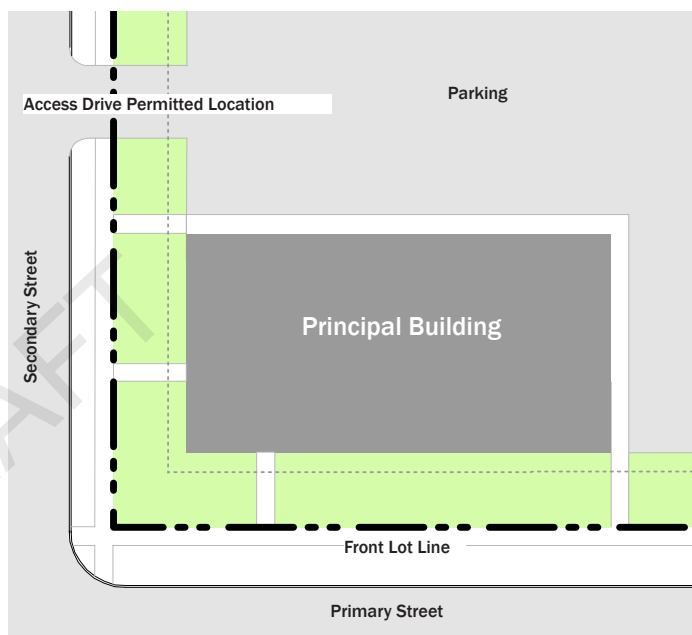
G (2). Secondary Street Frontage: Access Drive Permitted Location
